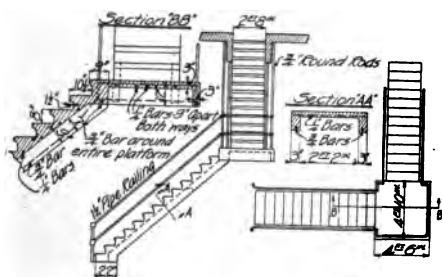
SKETCHES OF STAIR CONSTRUCTION.
